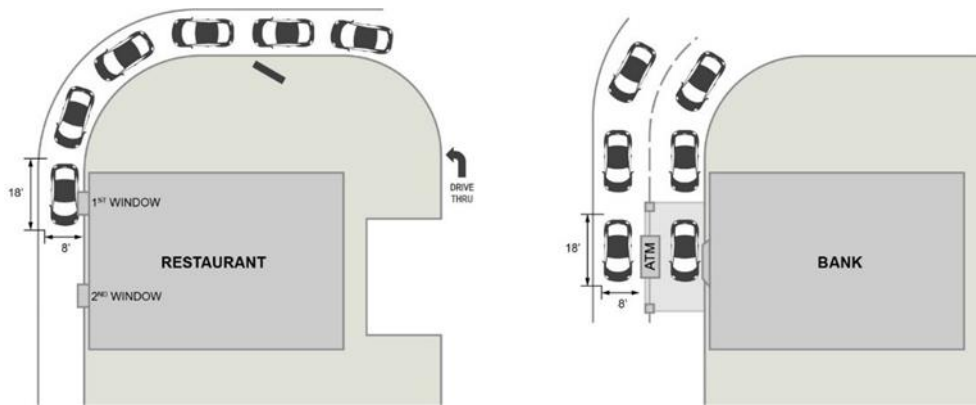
A: Illustrative example of stacking space requirements for a bank and a restaurant.
